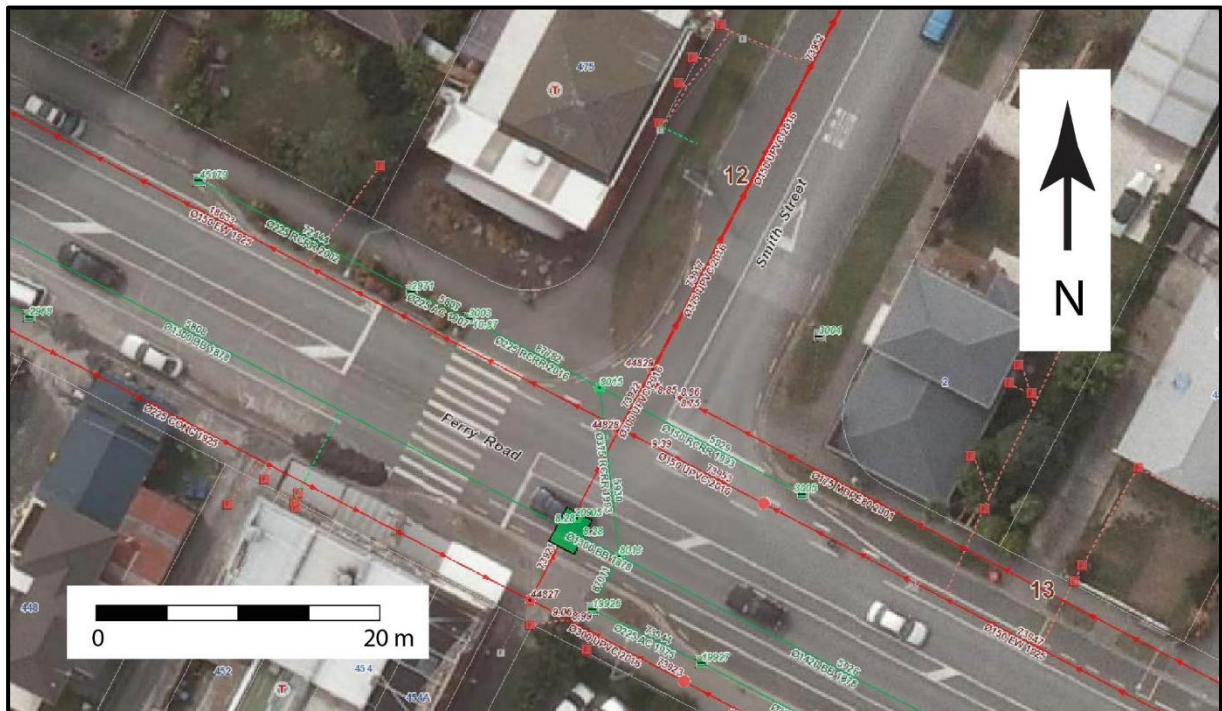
The Ferry Road/Smith Street intersection, showing the wastewater pipes (in red) and stormwater pipes (in green). The location of the new manhole atop the Ferry Road stormwater brick barrel, where the wastewater pipe crossing was made, is indicated by the green square. Image: SCIRT n.d.
